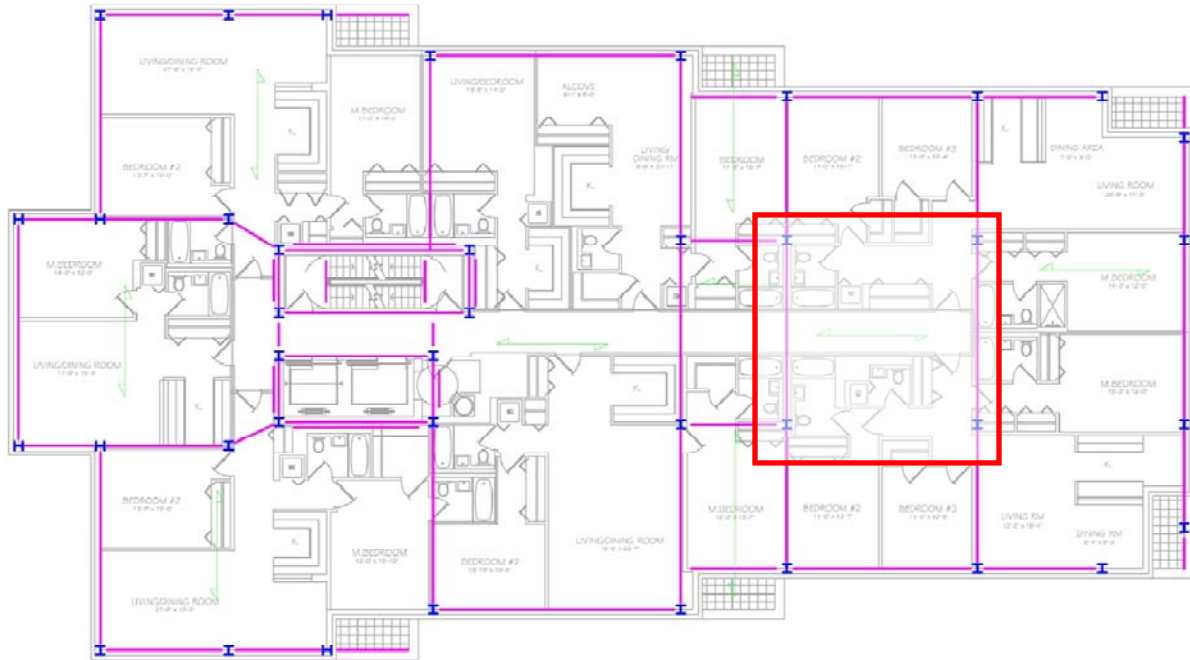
Framing Plan for Girder-Slab flooring system. Red box indicates the interior bay that was analyzed.
